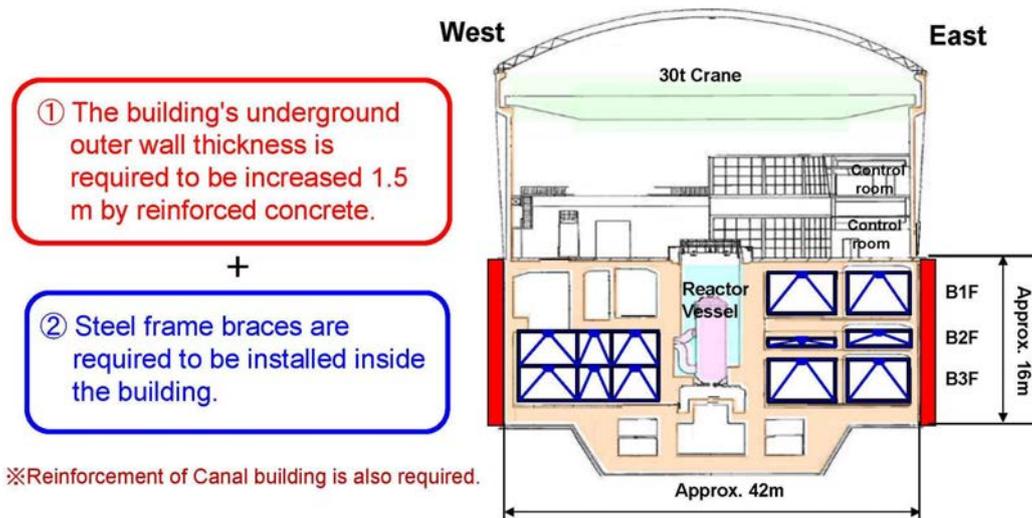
Seismic reinforcement of the JMTR reactor building, vertical cross-sectional view.
